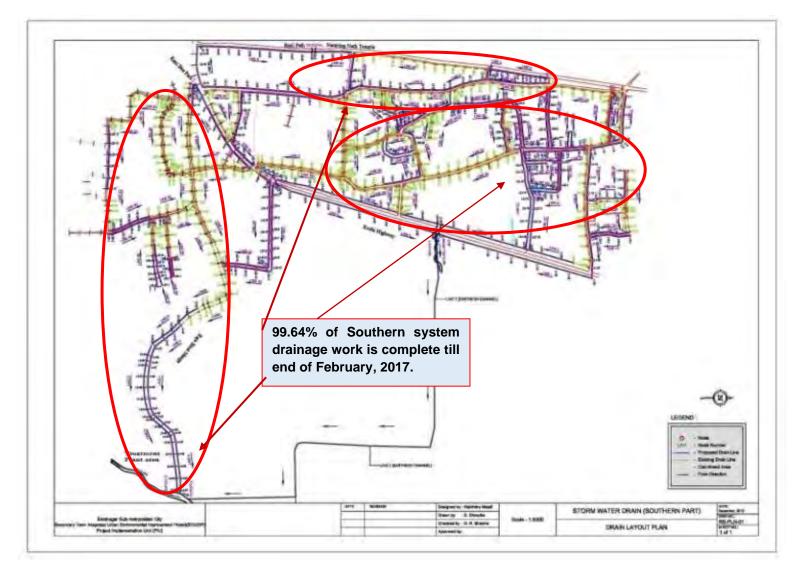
Proposed Storm Water Drains in BSMC (Southern Drainage System)
